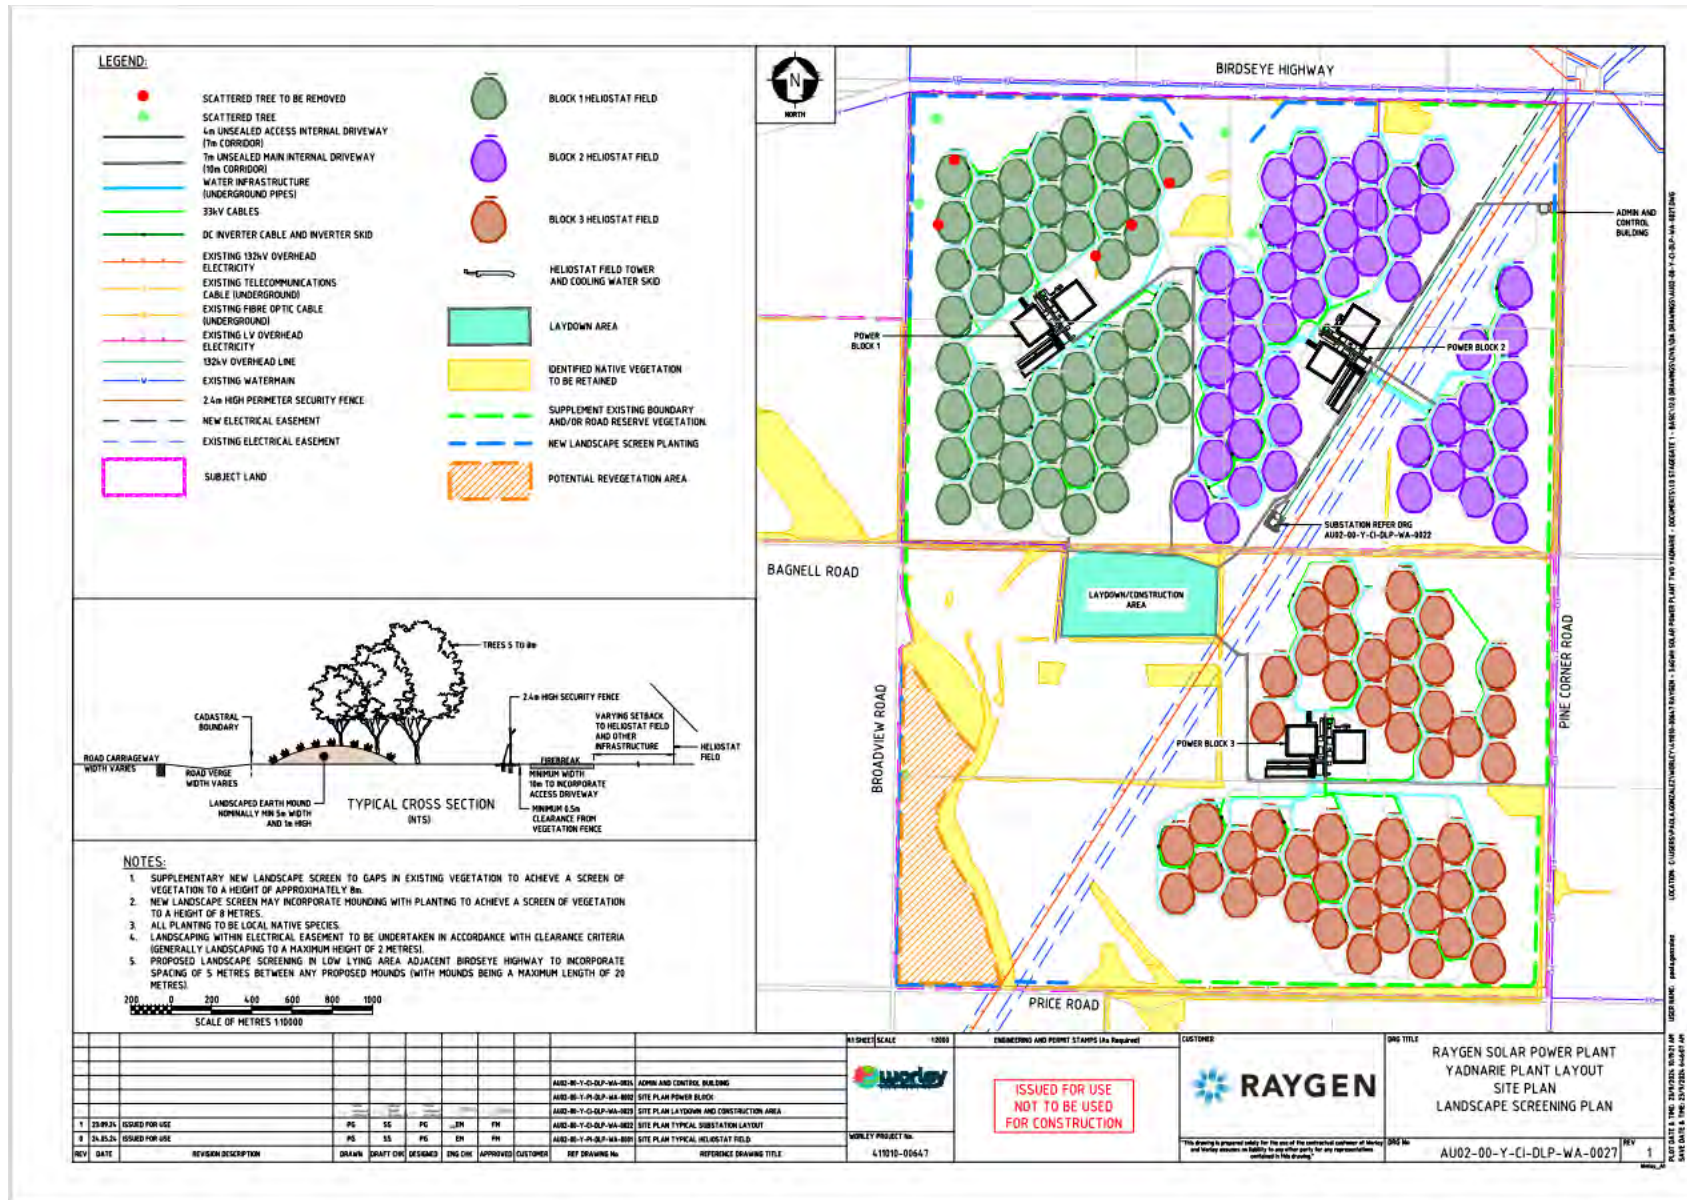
Project design supplied to EBS by MasterPlan 24/9/2024.
